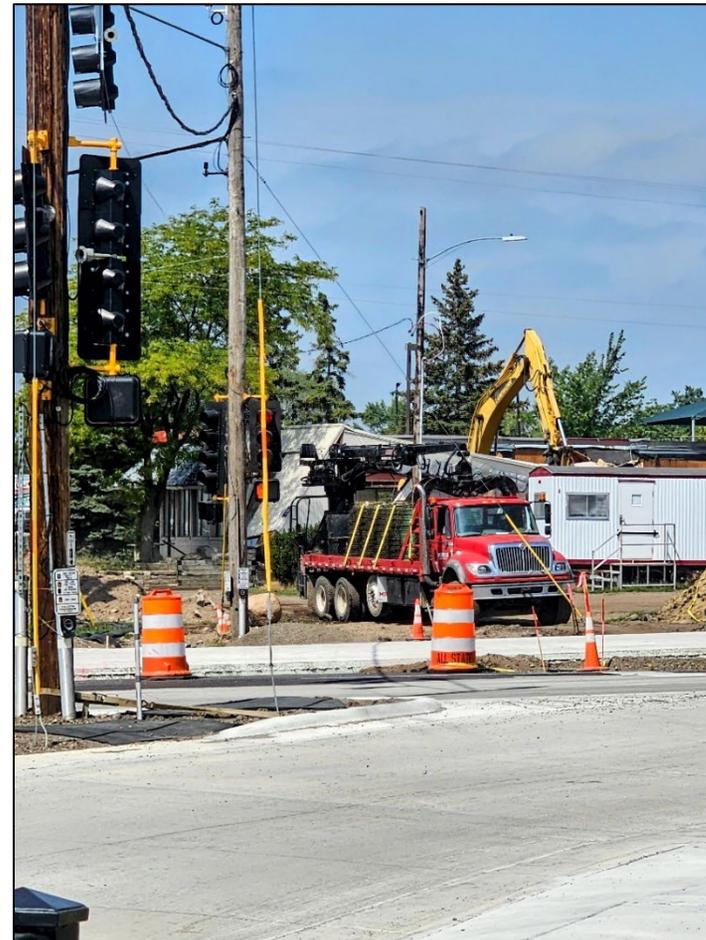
Crews working on the reconstruction of the US 10/MN 23 interchange in Saint Cloud. Photo courtesy Saint Cloud APO.
